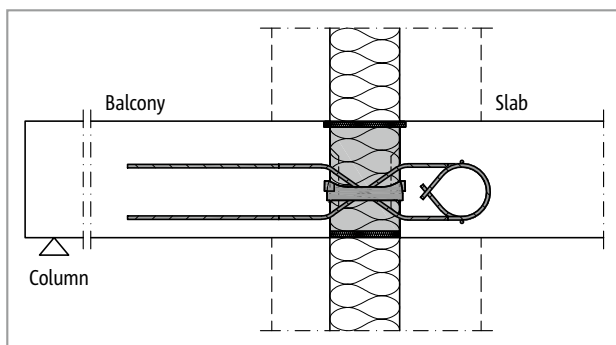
Schöck Isokorb® XT Type Q: Connection with non-load-bearing cavity masonry
